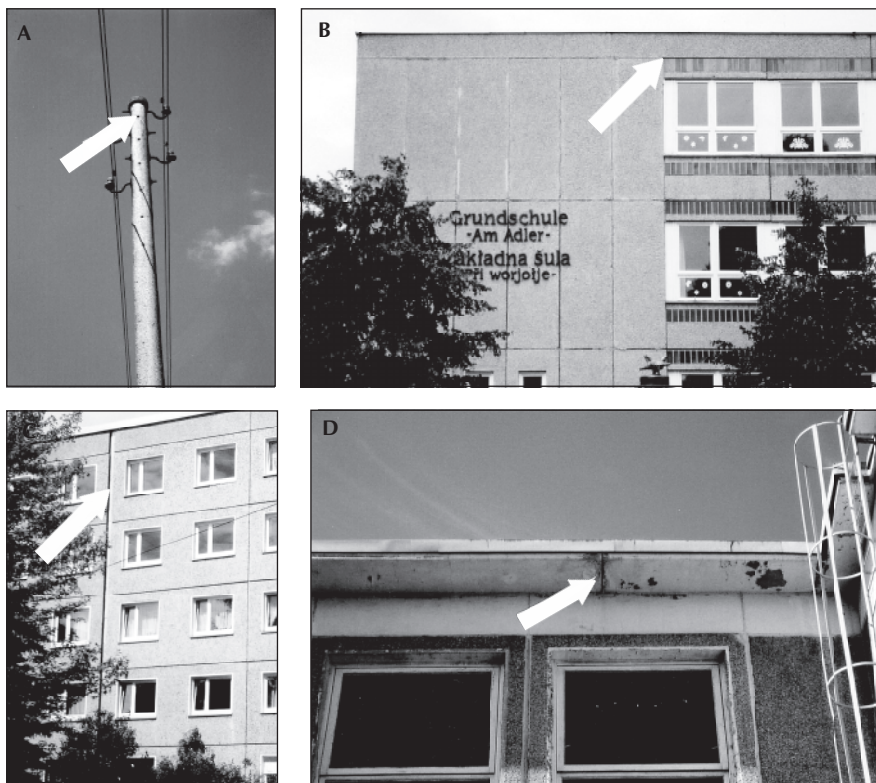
The different summer shelters of *Pipistrellus pipistrellus*: A – in a concrete mast; B – in a crack above a window in a school building; C – in the expansion joint of a residential block; D – in a crack under the flat roof. Phot. Ch. Schmidt.
